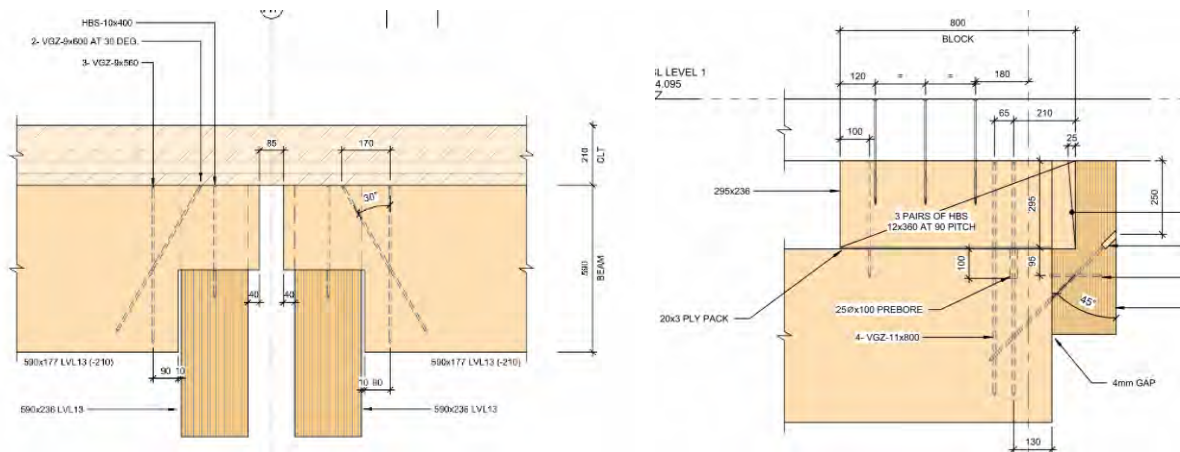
(Left) Typical Secondary beam, (Right) Typical primary beam connection
